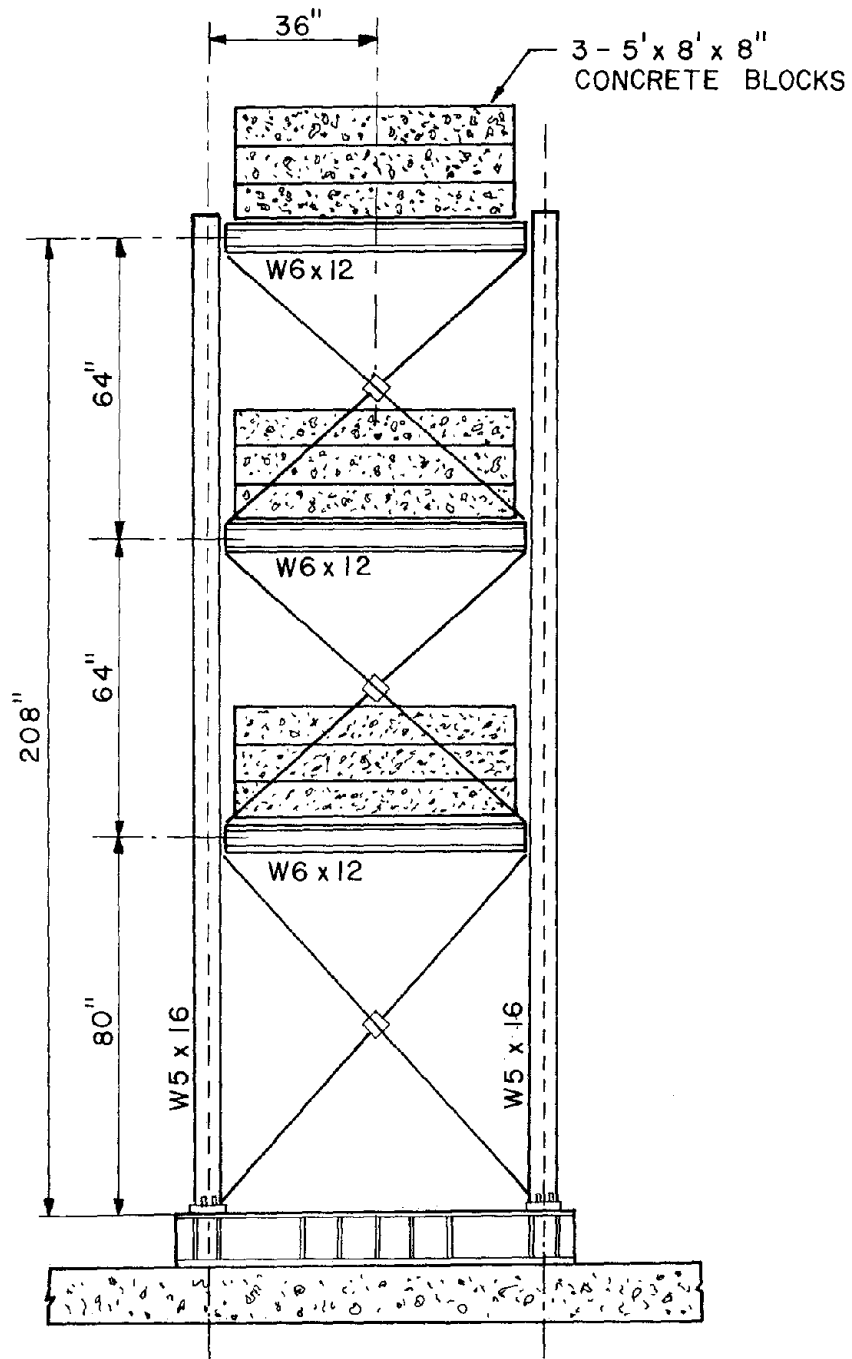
Front Elevation of the Test Structure with Pipe Braces
